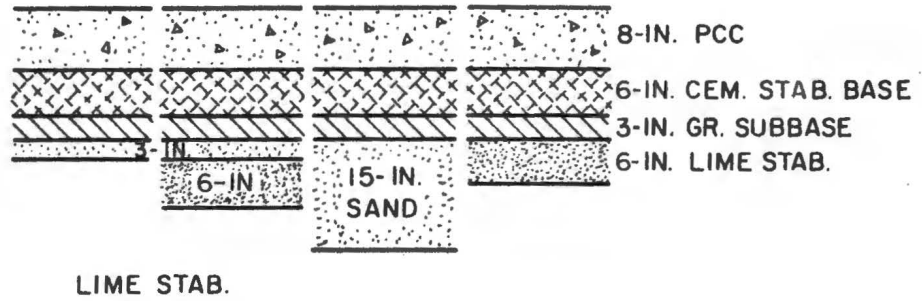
Current Fill and Pavement Designs in South Dakota
